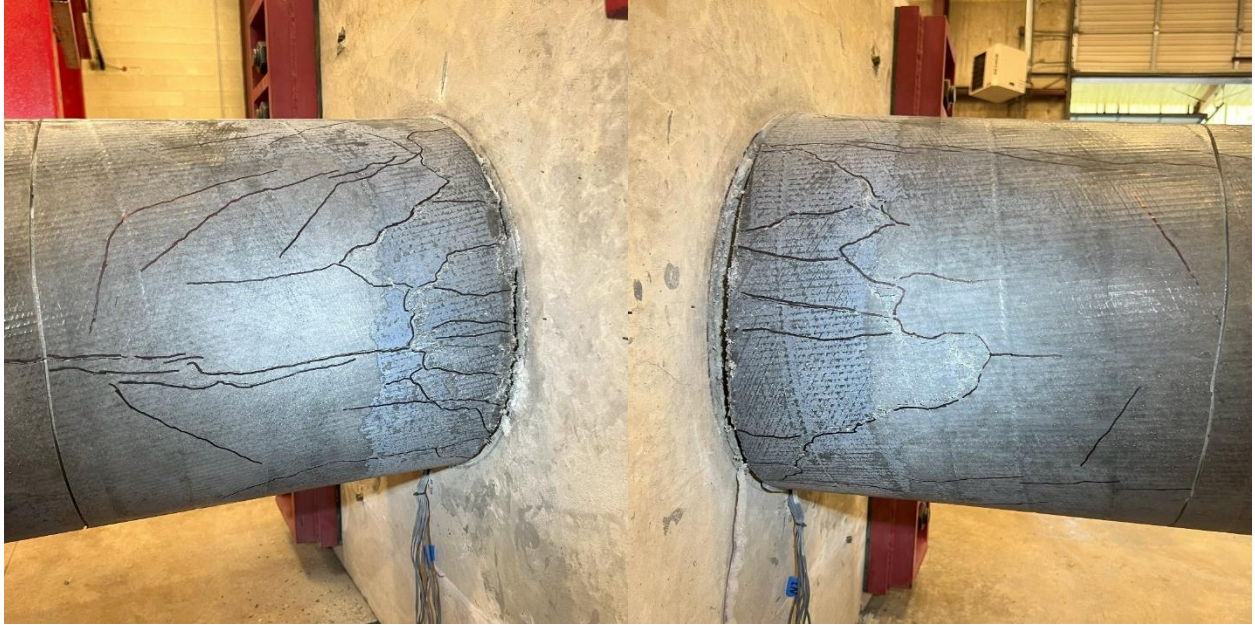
UHPC 2 Concrete Core West Side (l) and East Side (r) Crack Mapping
